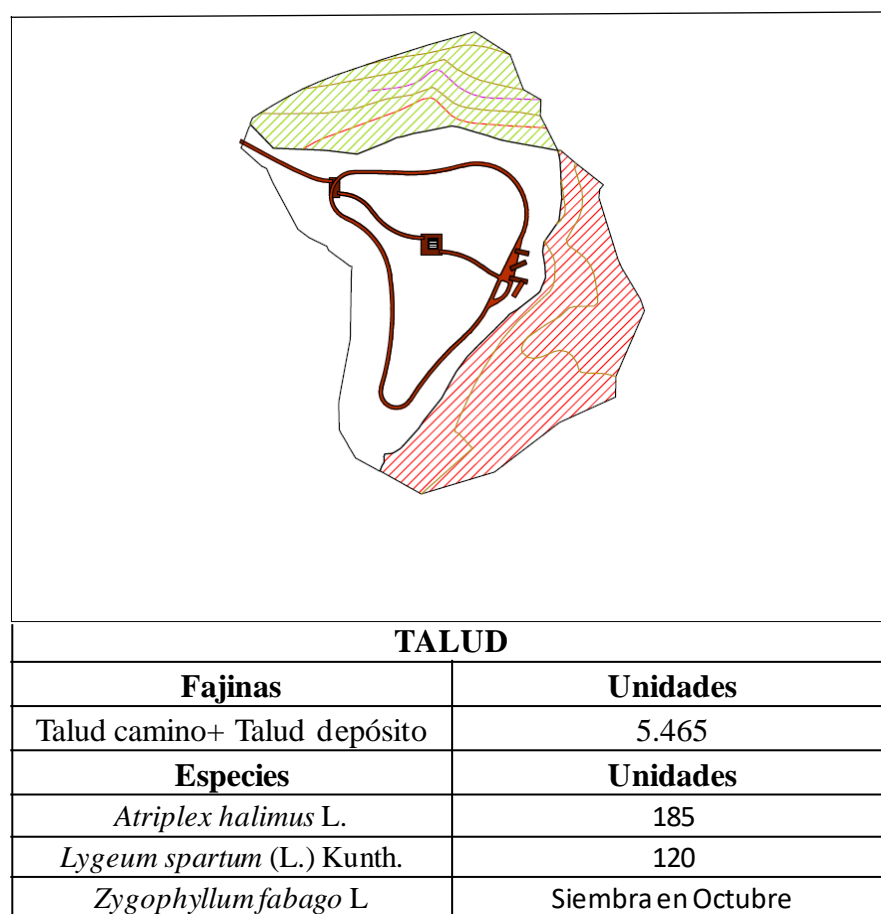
Planting plan for the stabilization of slopes of Case Study 1.
